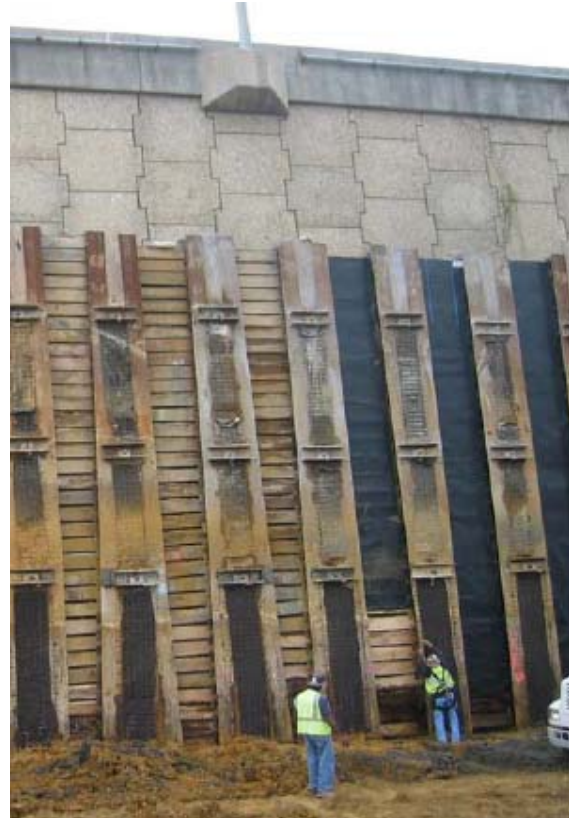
, Paper 8.04.a: Photograph of soldier piles showing the existing MSE.
